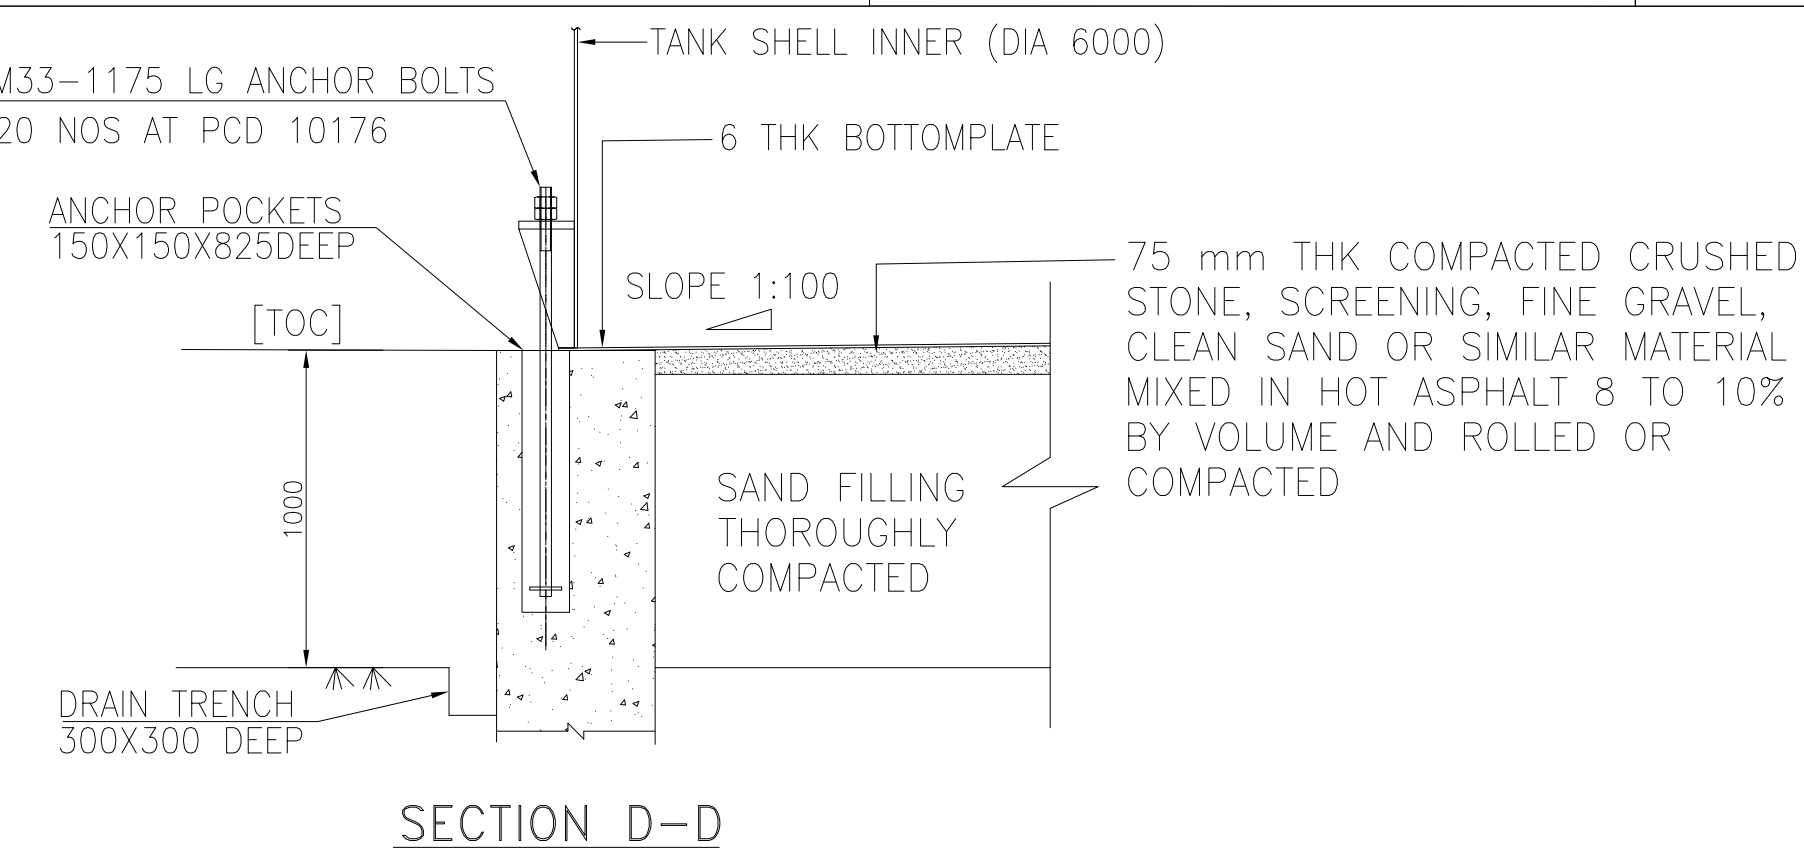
DETAIL OF ANCHOR CHAIR AND ANCHOR BOLT
